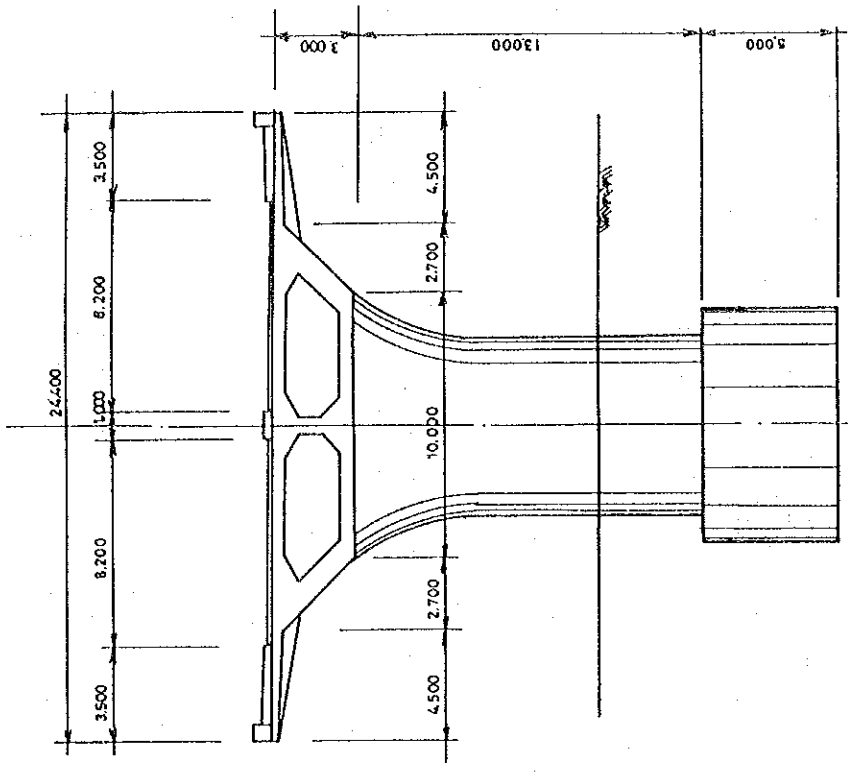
Continuous Post-tensioning Concrete Box Girder with Solid Wall Pier on Caisson Foundation
